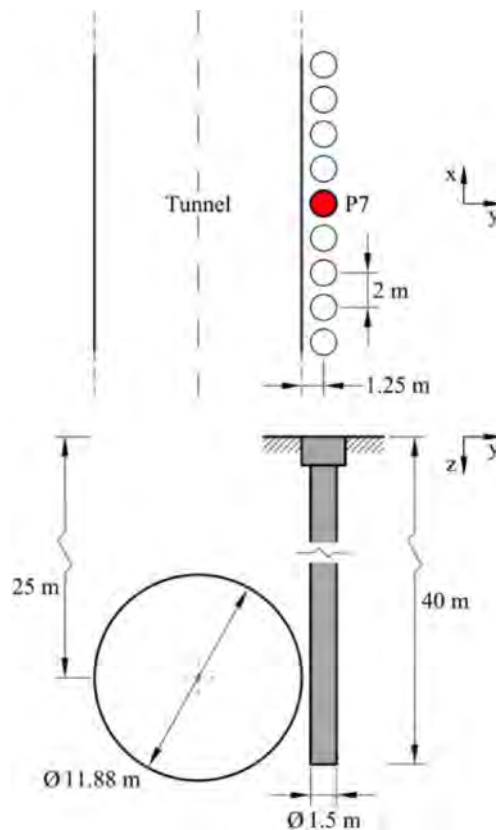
Geometry of the analysed protection pile wall of the Glory façade of Sagrada Família.
